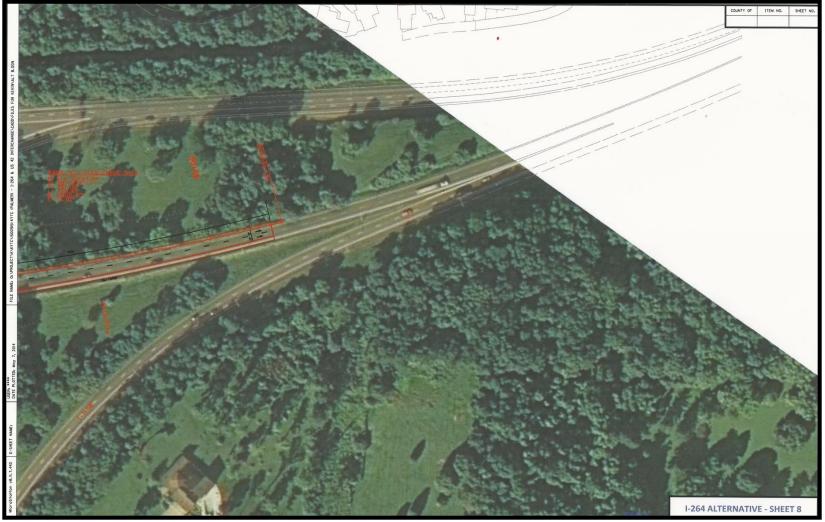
Alternative B: Preferred I-264 Widening Alternative – Sheet 8 (DRAFT)
